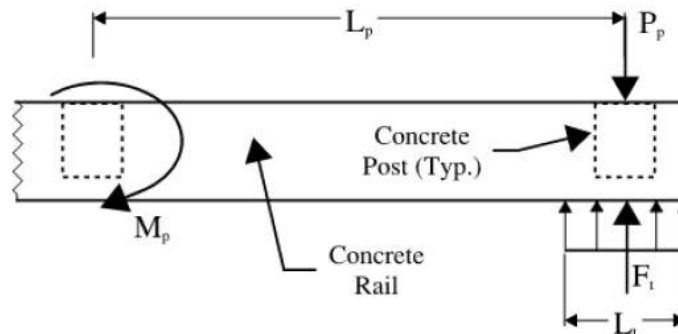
Single-Span Failure Mode for Post-and-Beam Railings at an End Section or Joint
